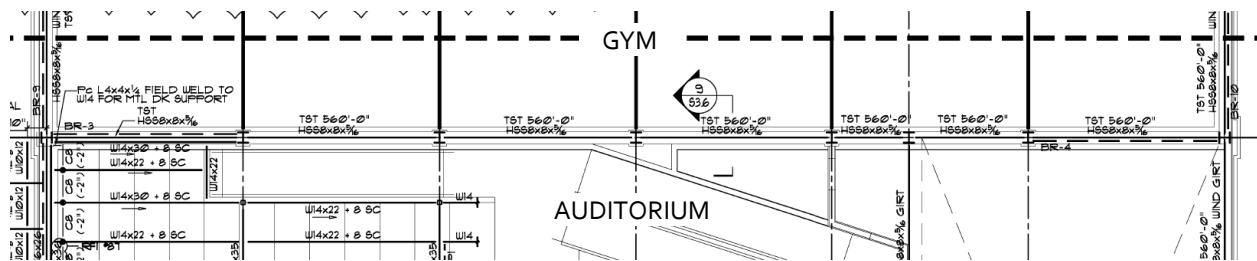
IMAGE: ELEVATION OF EXTERIOR AUDITORIUM WALL
